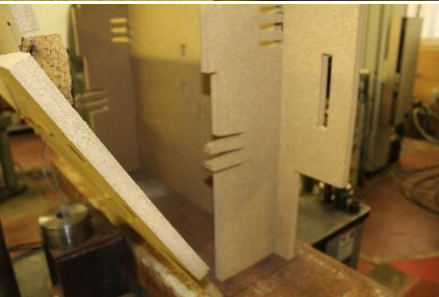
Test piece failure under axial compression. One sheathing panel buckled towards the outside and was maintained solely by the snap-fit cantilever arm head till failure.
